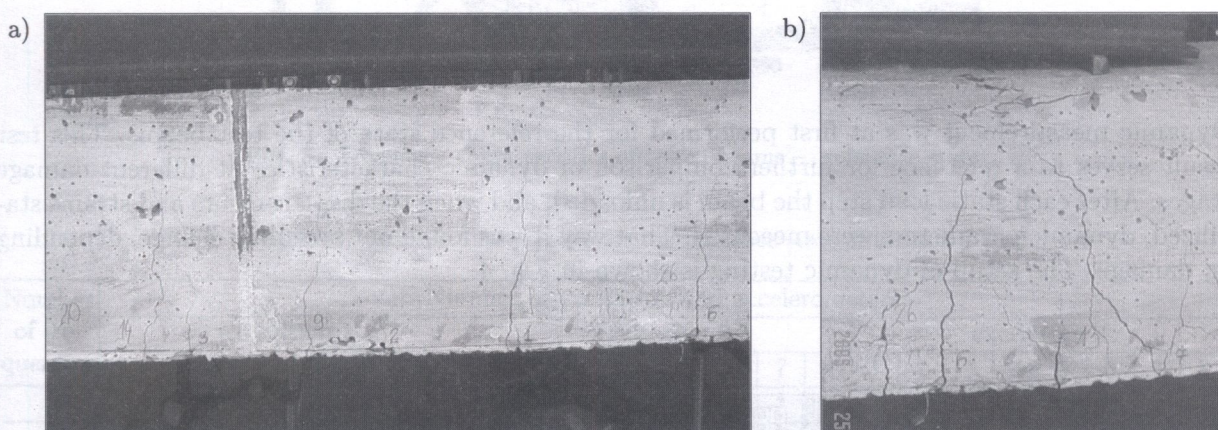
Crack pattern and damage: a) state 2, b) state 4, failure of the beam
